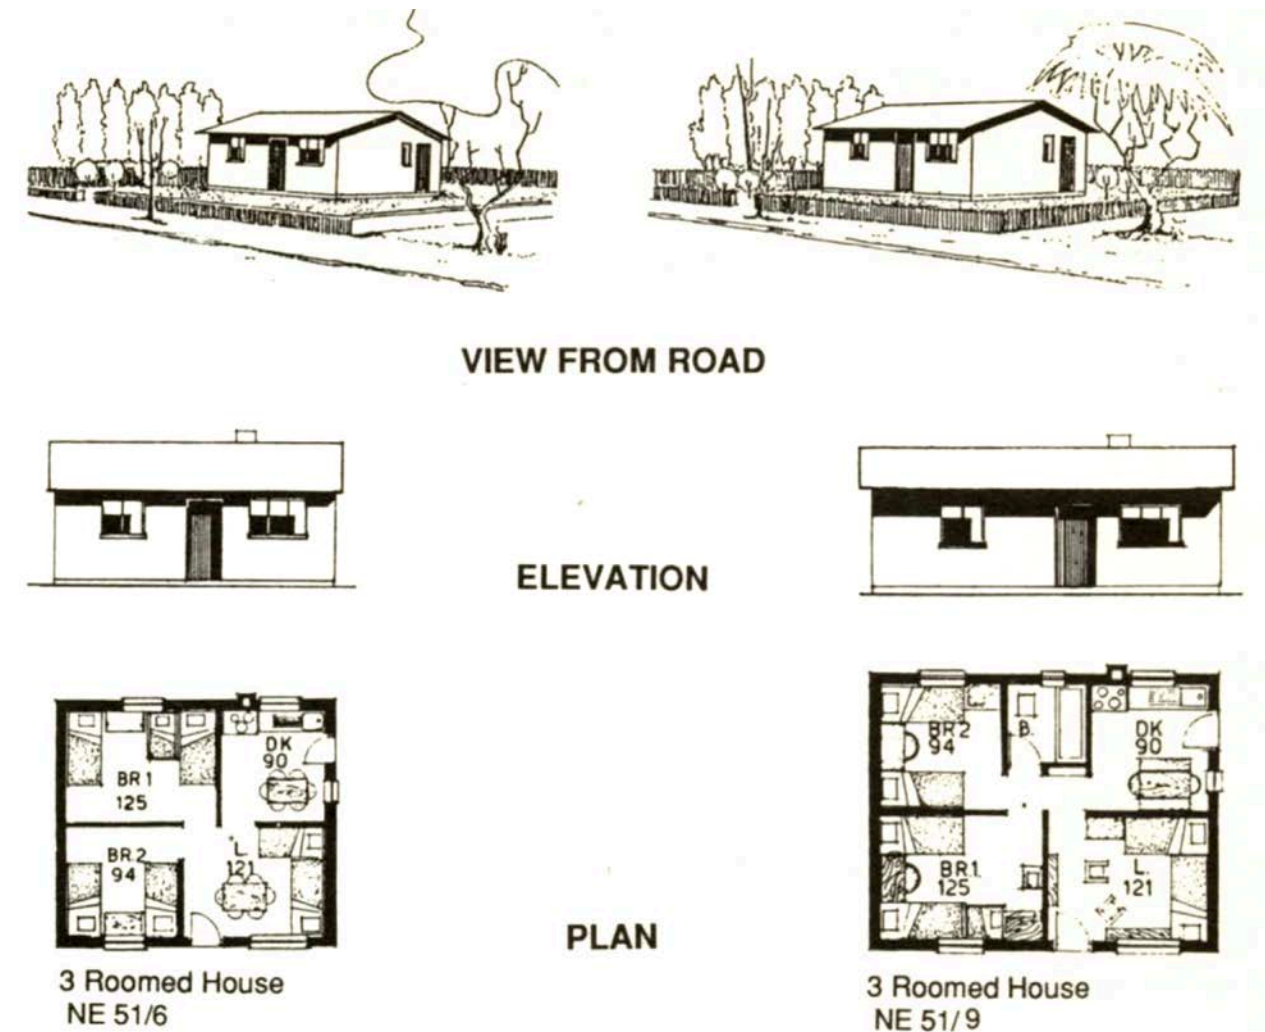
Plan drawing of standardised housing block in Macassar. By author 2020.
